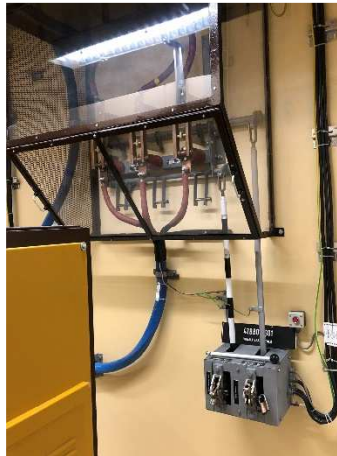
6 kV power cables of electrical switch room in KKÁT facility
